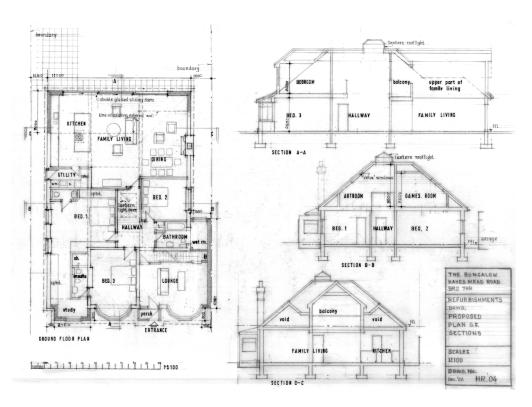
Ground floor plan and sections of previously refused application (ref. 23/00790/FULL6)
